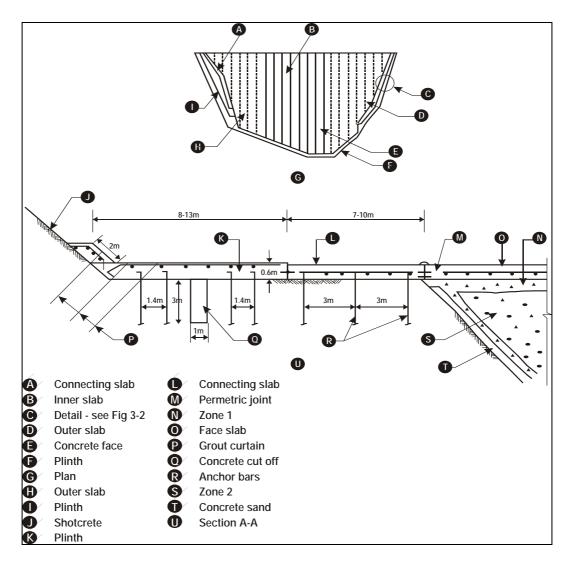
Salvajina Dam plinth founded on less competent rock (Kleiner, 2005-e).
